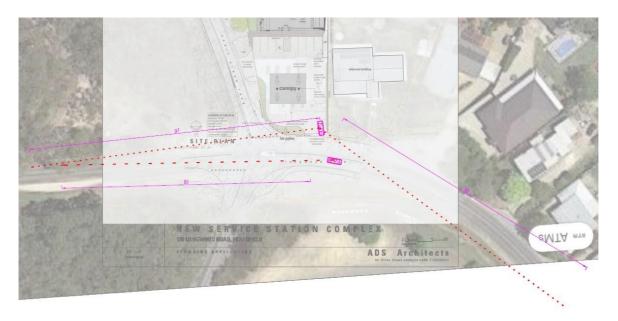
Required SISD(EDD) and MGSD for a driver accessing the proposed retail fuel outlet on Longwood Road
